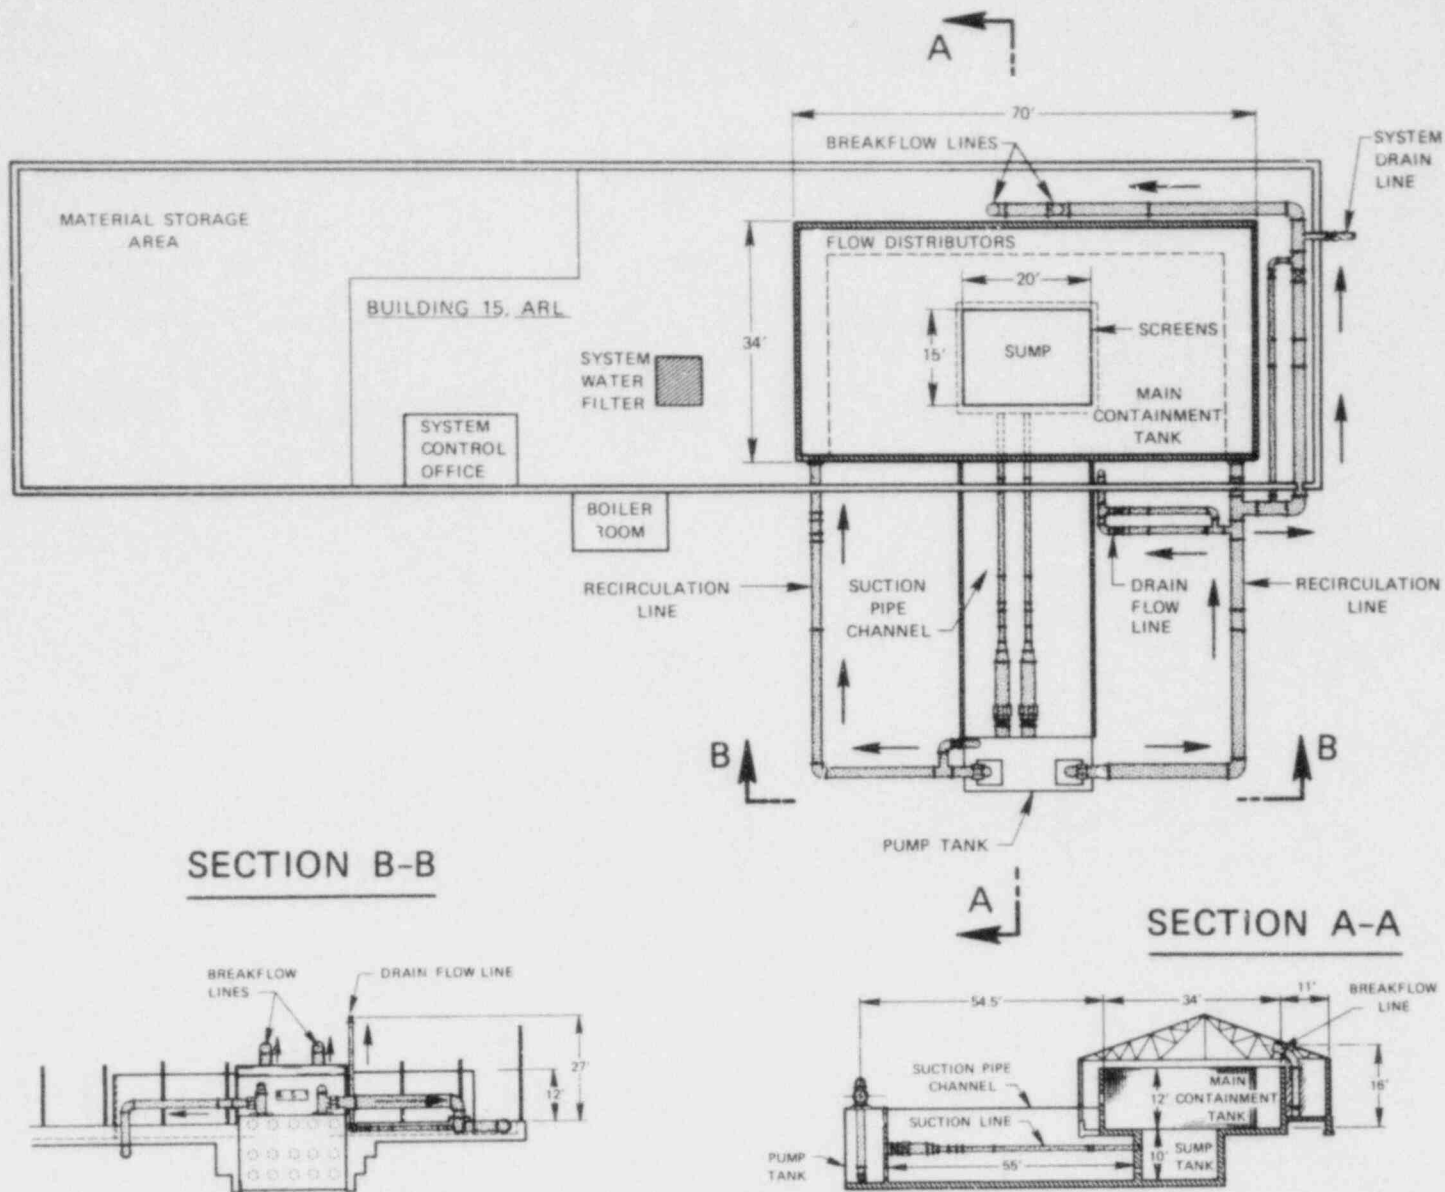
Details of the Main and Sump Tanks and of the Piping
